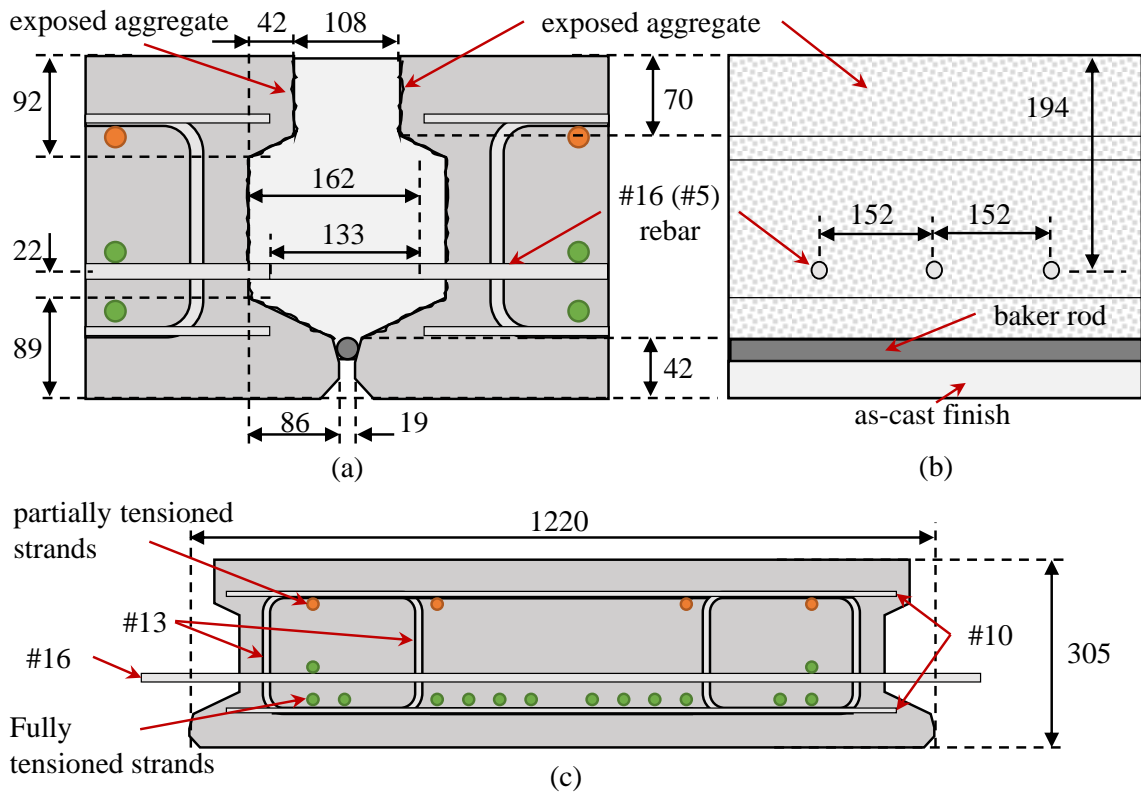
Slab-beam section details for two-beam system tests: (a) keyway detail, (b) side-joint detail, and (c) cross-section reinforcement detail. Note: design is for 9150-mm beam length (units: mm, 1 mm = 0.0394 in.)
